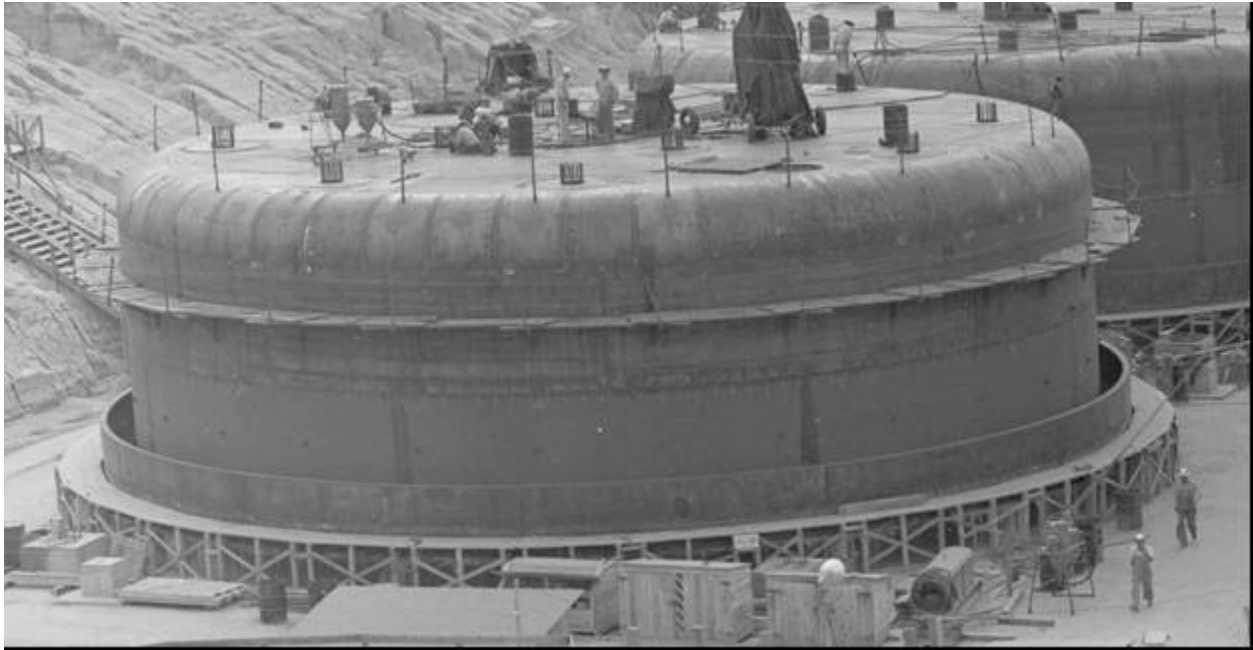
Tanks 1 through 8 Steel Liner Construction
